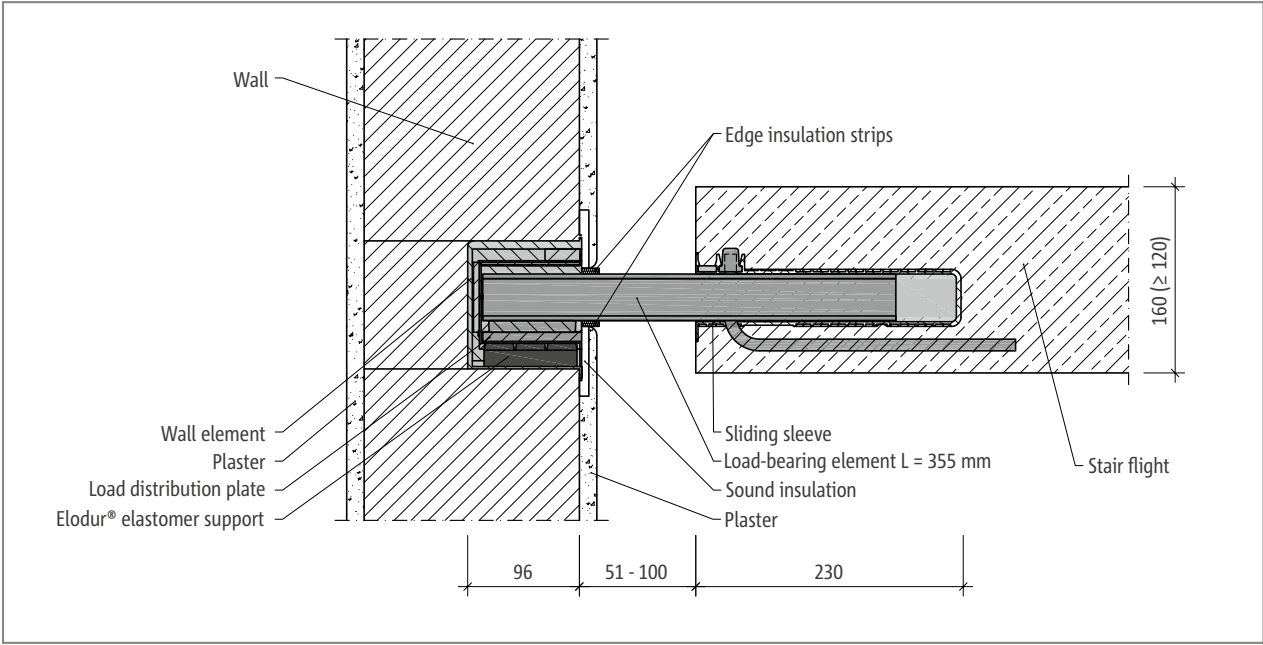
Schöck Tronsole® type Q-FV-XL or Q-A2-XL: Installation cross-section
